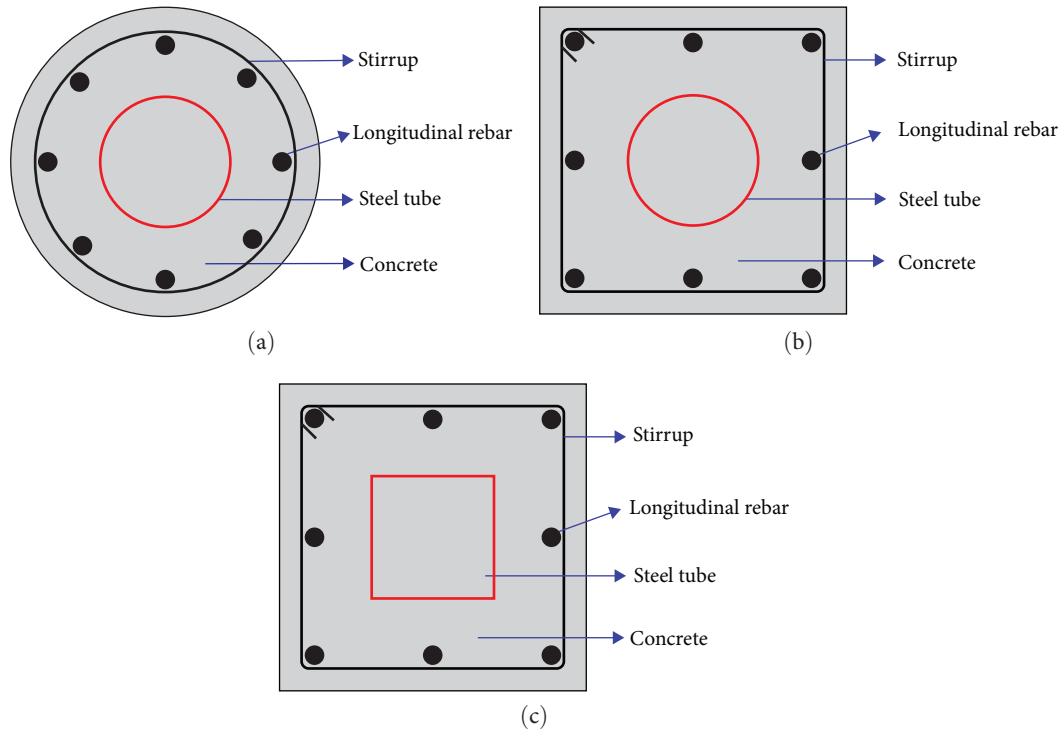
Typical cross-section of the CFCST columns: (a) circular reinforced concrete with circular steel tube; (b) square reinforced concrete with circular steel tube; (c) square reinforced concrete with square steel tube.
